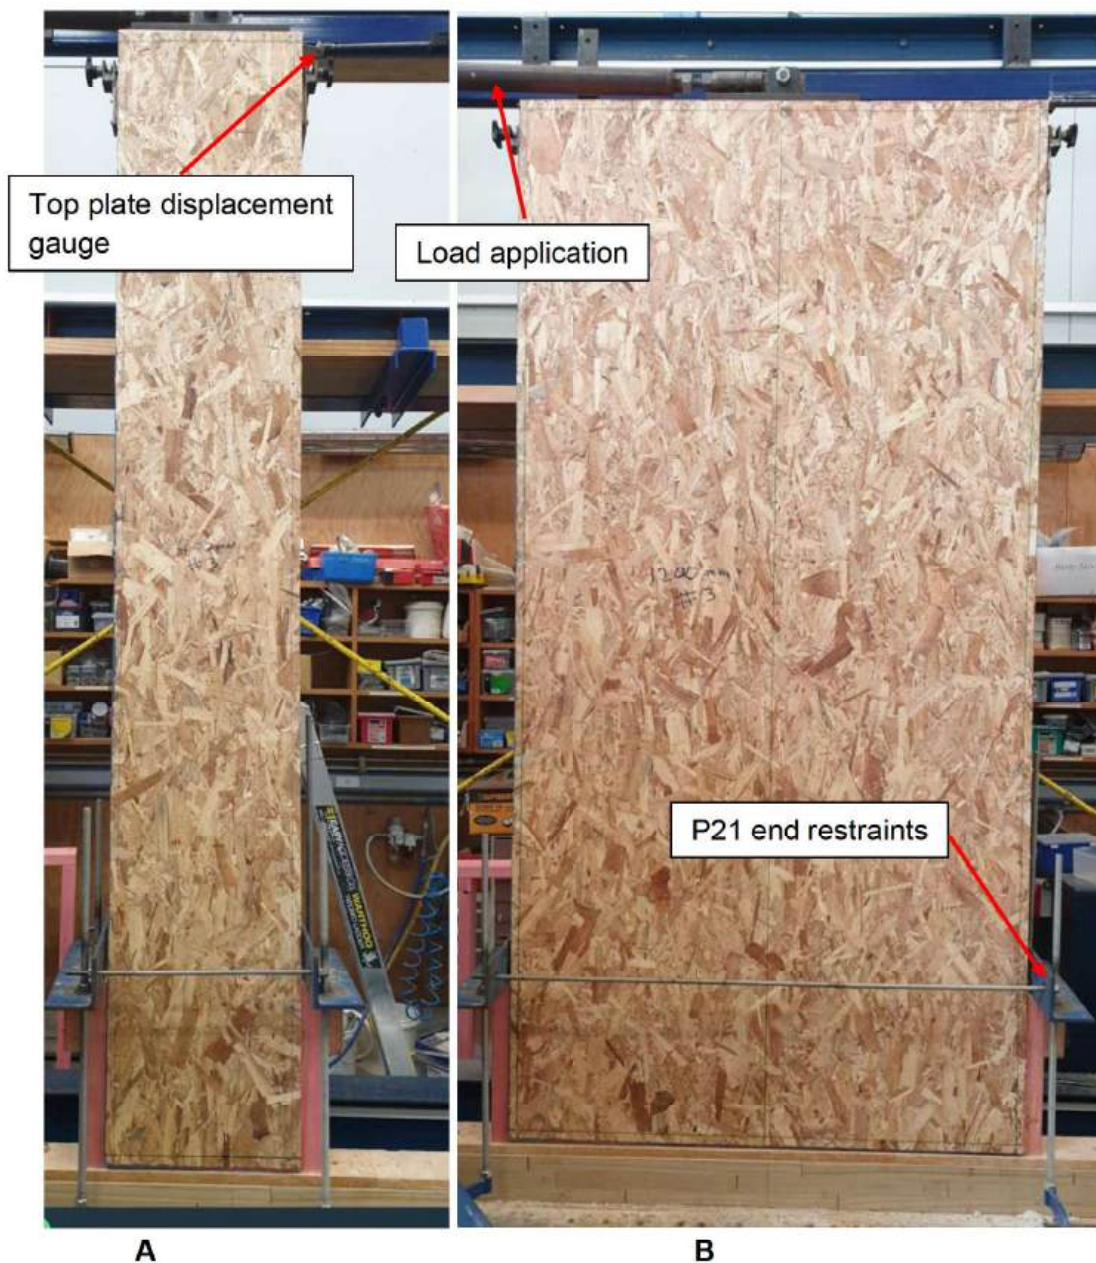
Specimen installed in test jig. (A) 400 mm wide sample. (B) 1200 mm wide sample.
